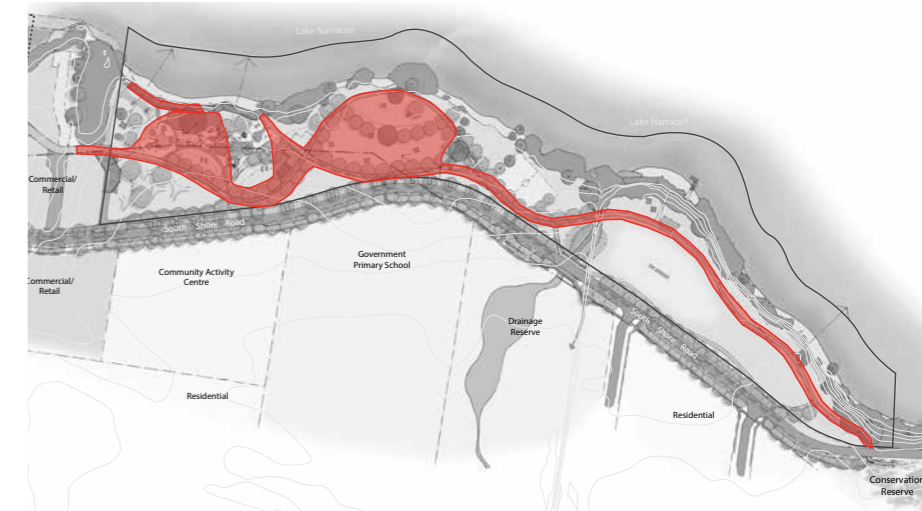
A: F-03 Landscape Masterplan Stage 1 Plan
